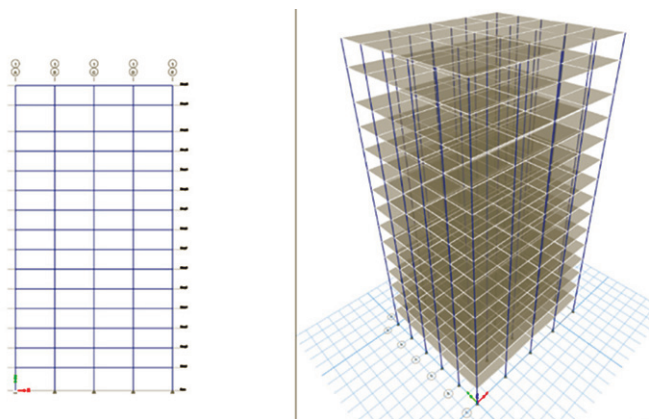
Views of the Stiffness Irregular-2 Model in elevation and 3D for both composite and RC buildings
